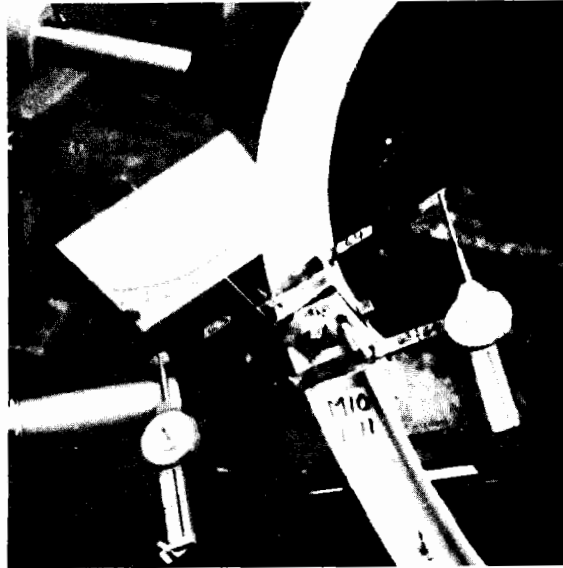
PHOTOGRAPHS SHOWING SECTION
